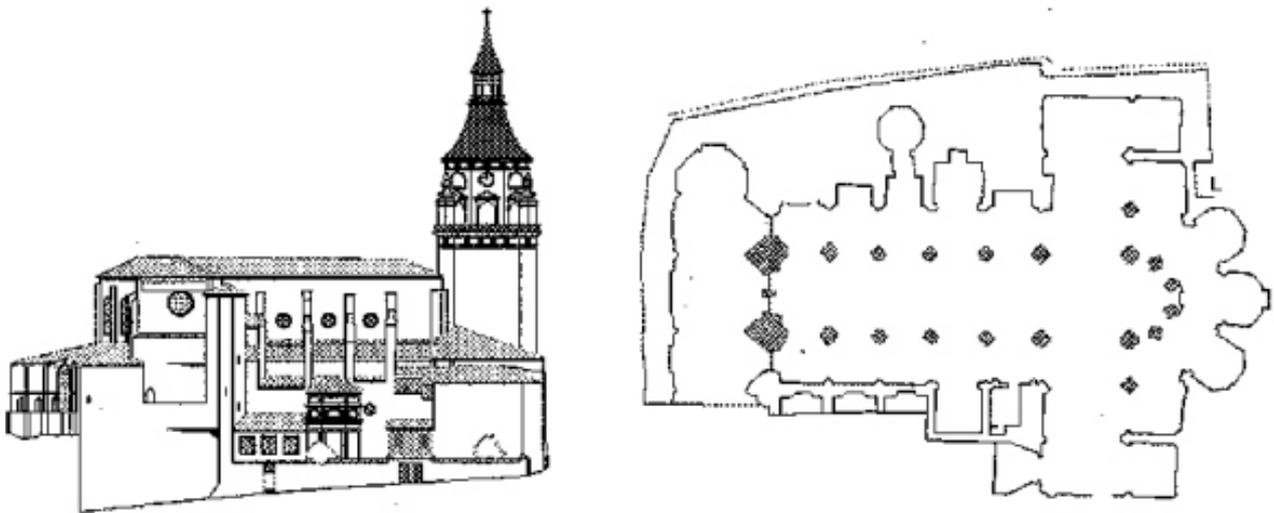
The Cathedral of Santa Maria: a) Front elevation, b) Ground plan.
